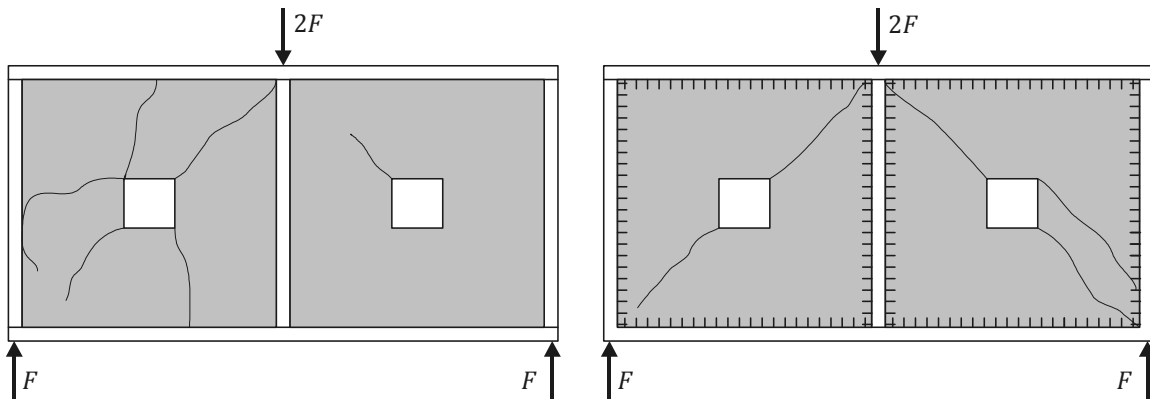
Crack patterns for non-integral (left) and fully-integral (right) infilled frame having a central opening
